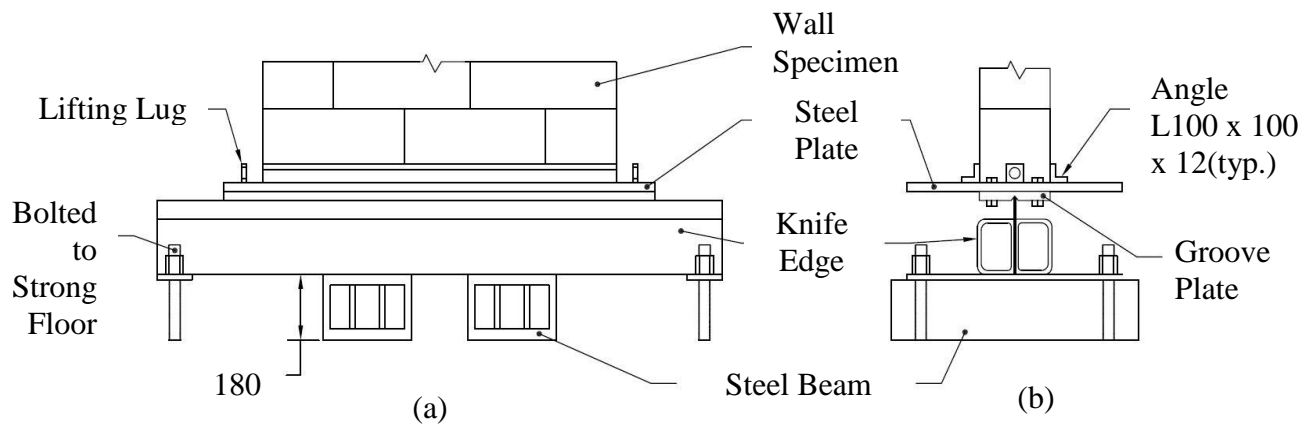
Ideal Bottom Support Setup: (a) Front View, and (b) Side View (Dimensions in mm)
